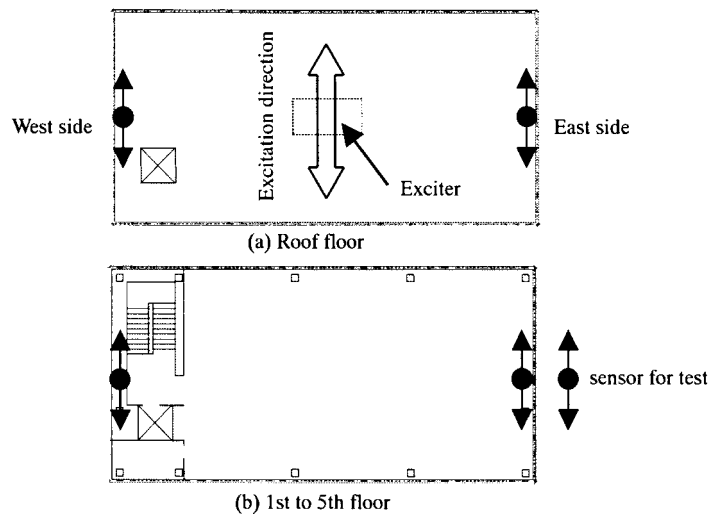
Arrangement of exciter and sensors: (a) roof floor and (b) 1st to 5th floor.
